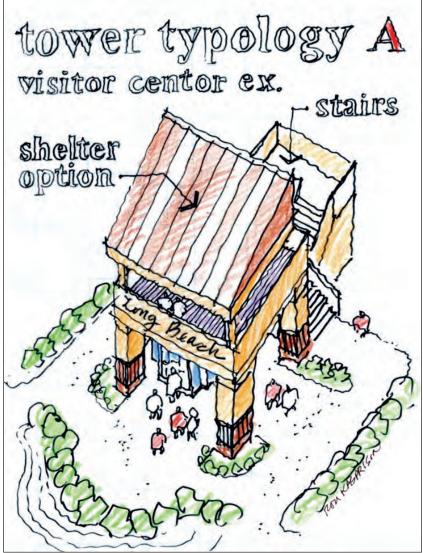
Basic tower structures A basic tower structure consists of an elevated platform on piers with access stair, ramp, or combination. A 'bare-bones' tower, essentially 40 *feet square (200 person capacity)* is a steel structure with a footprint of approximately 1,600 square feet (sf) minimum (a). Basic design *improvements can add temporary* activities on the ground level (information booth for example), landscaping, and a roof shelter. Additional adaptations can include a berm-tower combination to improve access for physically challenged persons and reduce the industrial appearance of the tower structure with landscaped berm areas. Drawing by Ron Kasprisin.
